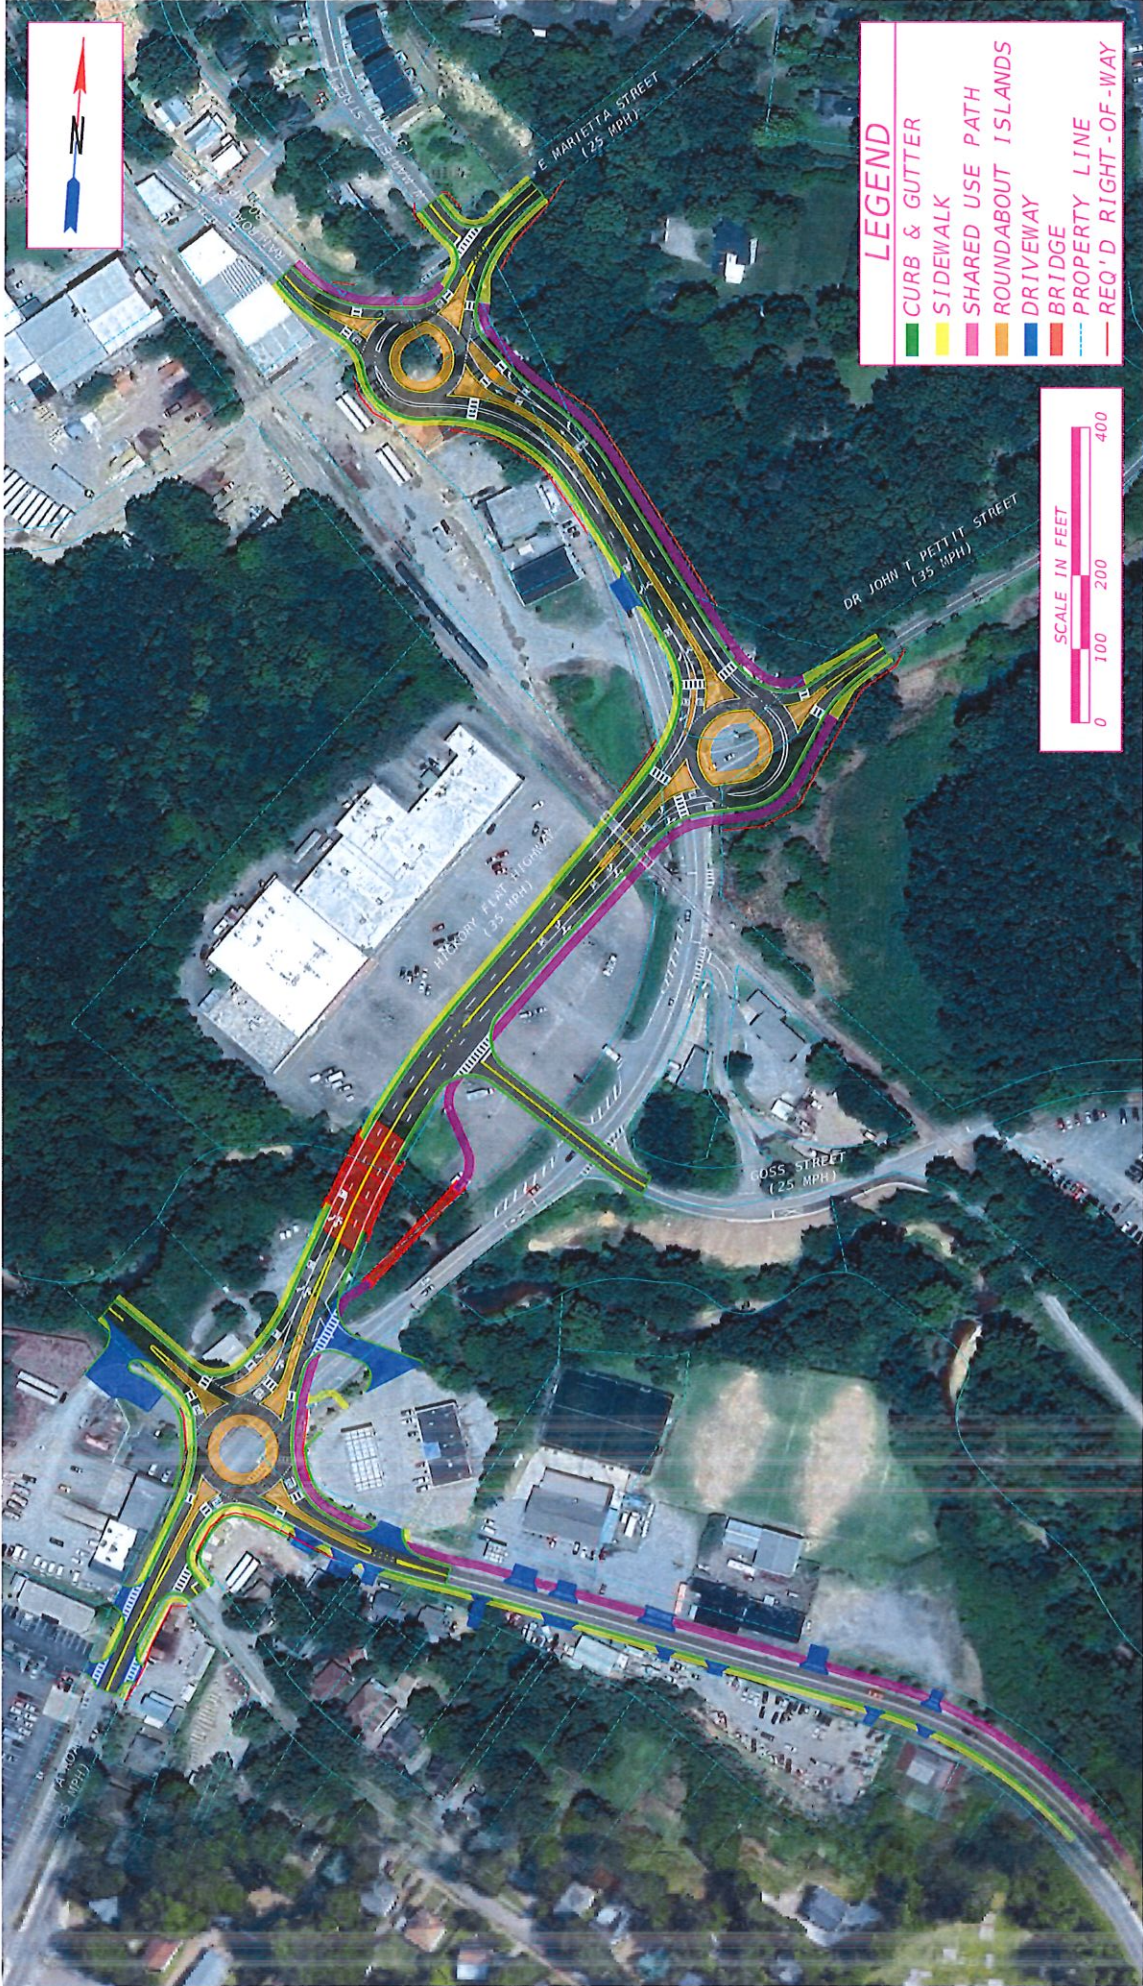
Hickory Flat Highway and Marietta Street Roadway Concept
